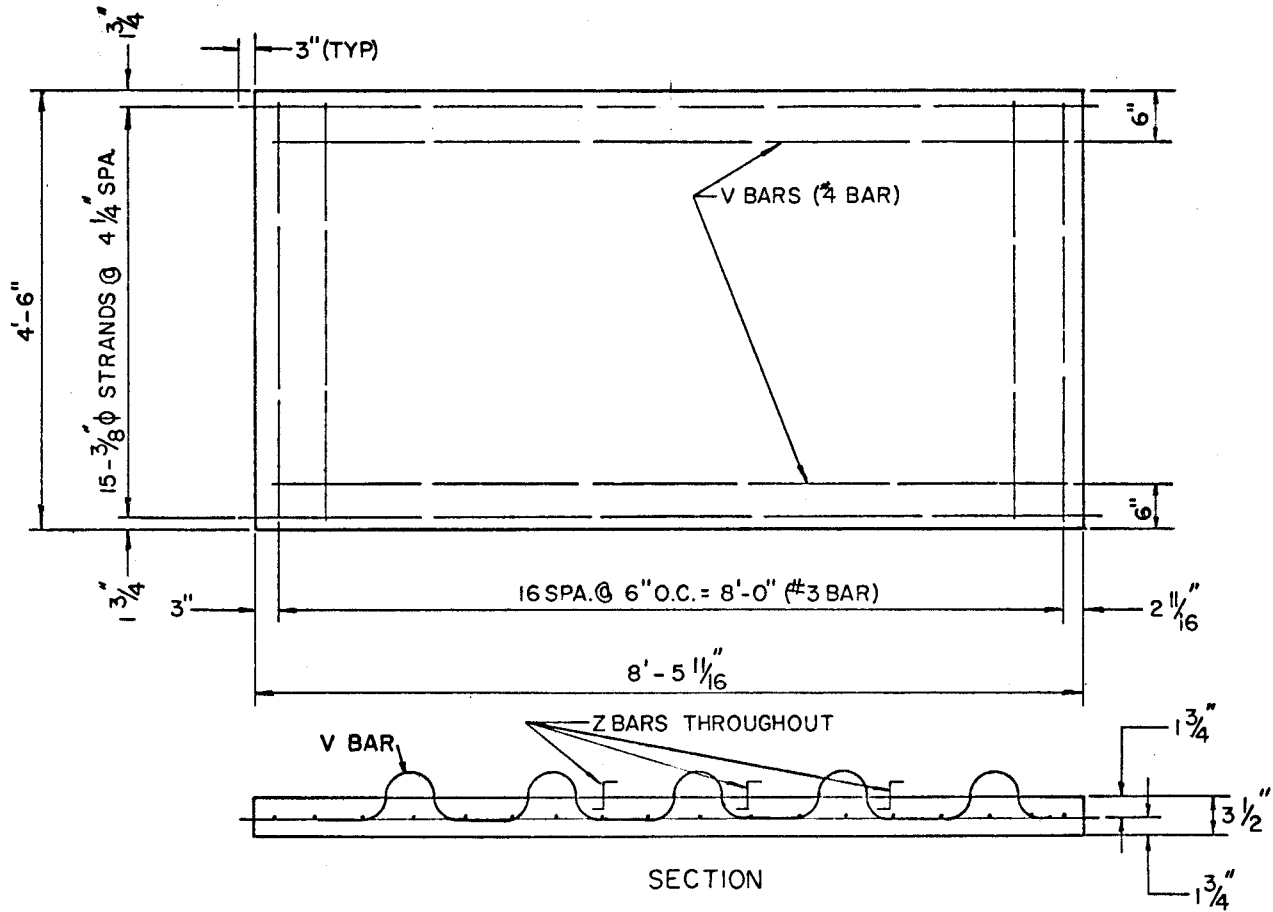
Detail of panels used in slab segment for loading no. 4 (Trinity River Bridge Panel).
